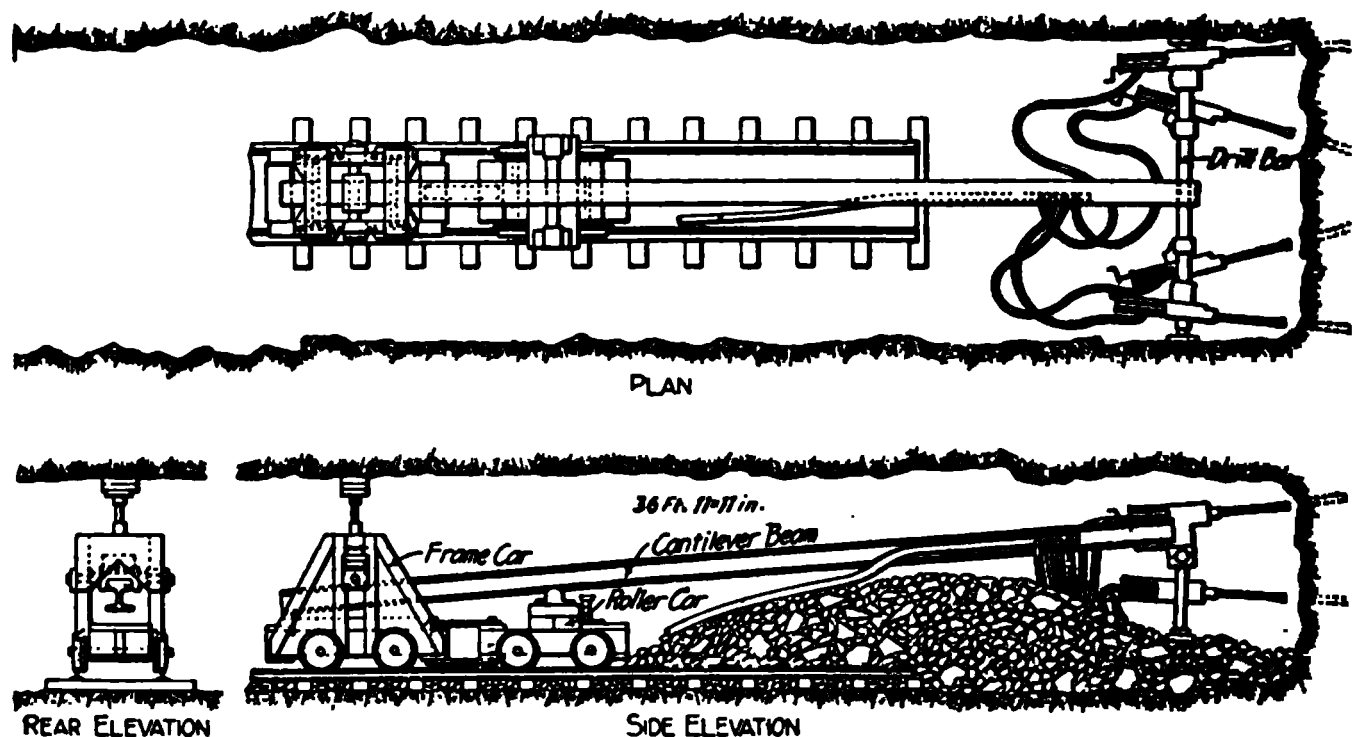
Simplest type of carriage, a long adjustable cantilever arm extends drills on horizontal bar over muck pile.
